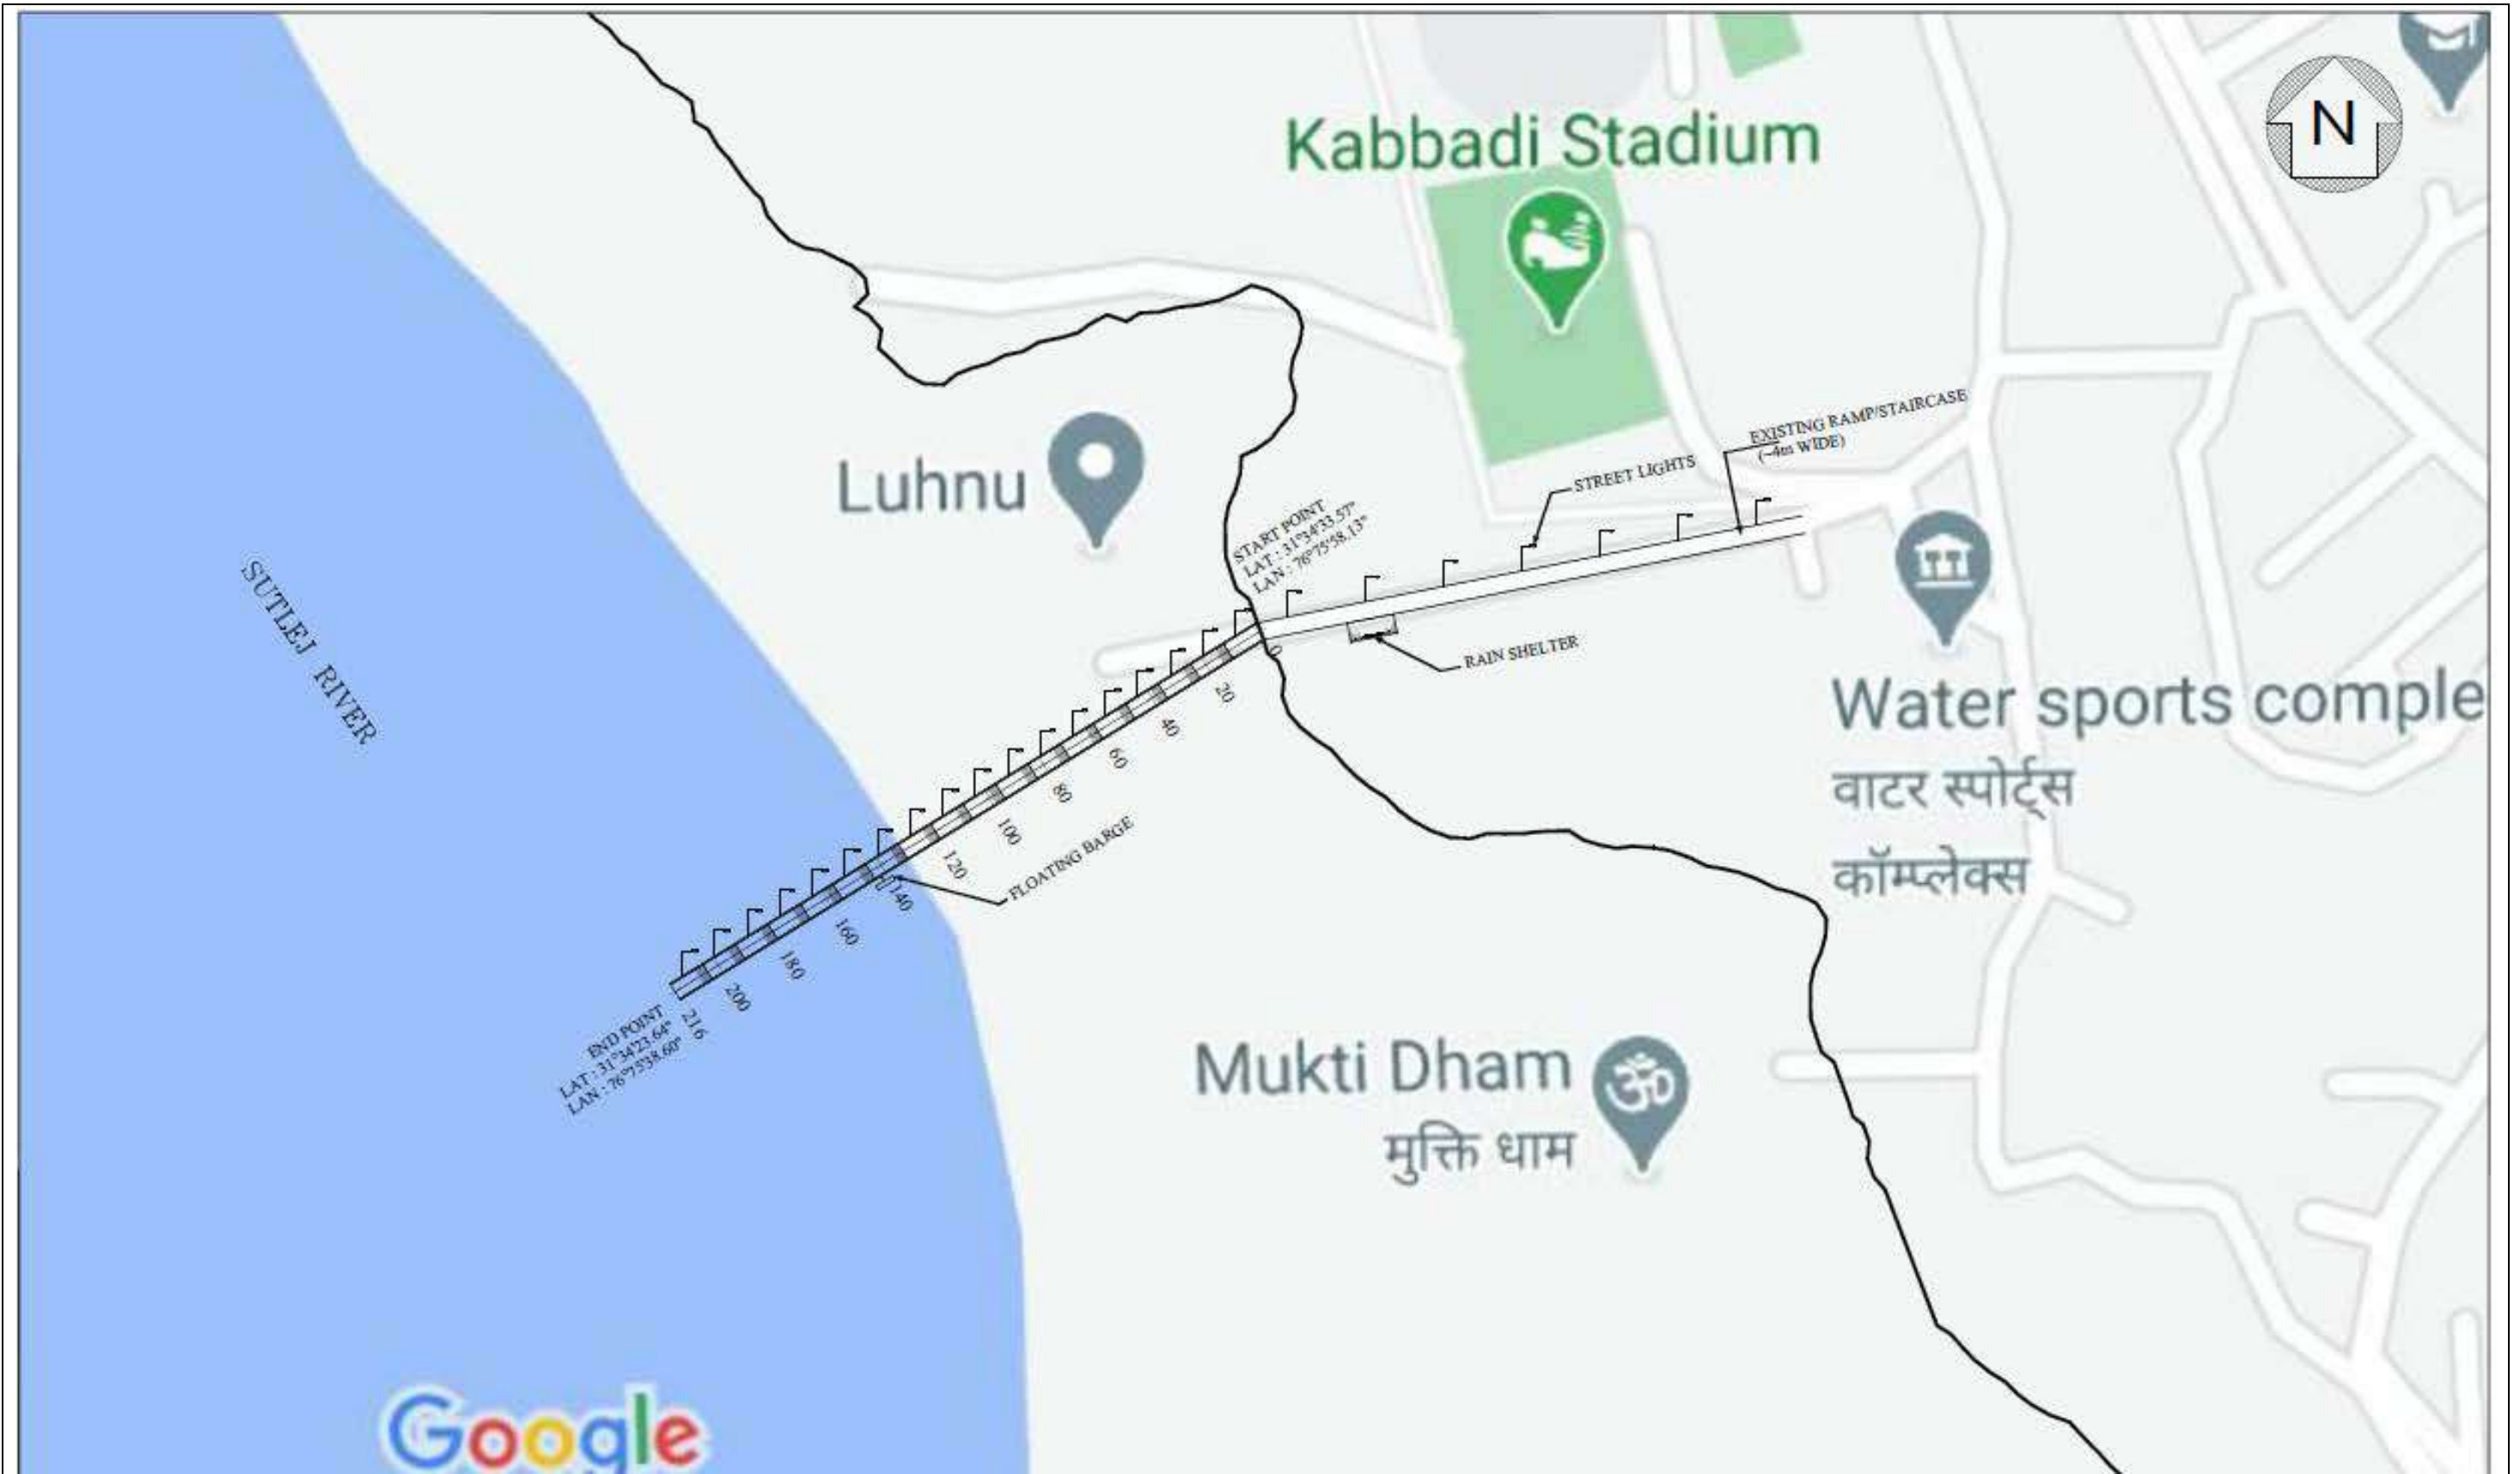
Plan of Proposed Jetty Facility near Luhnu Stadium Bilaspur
